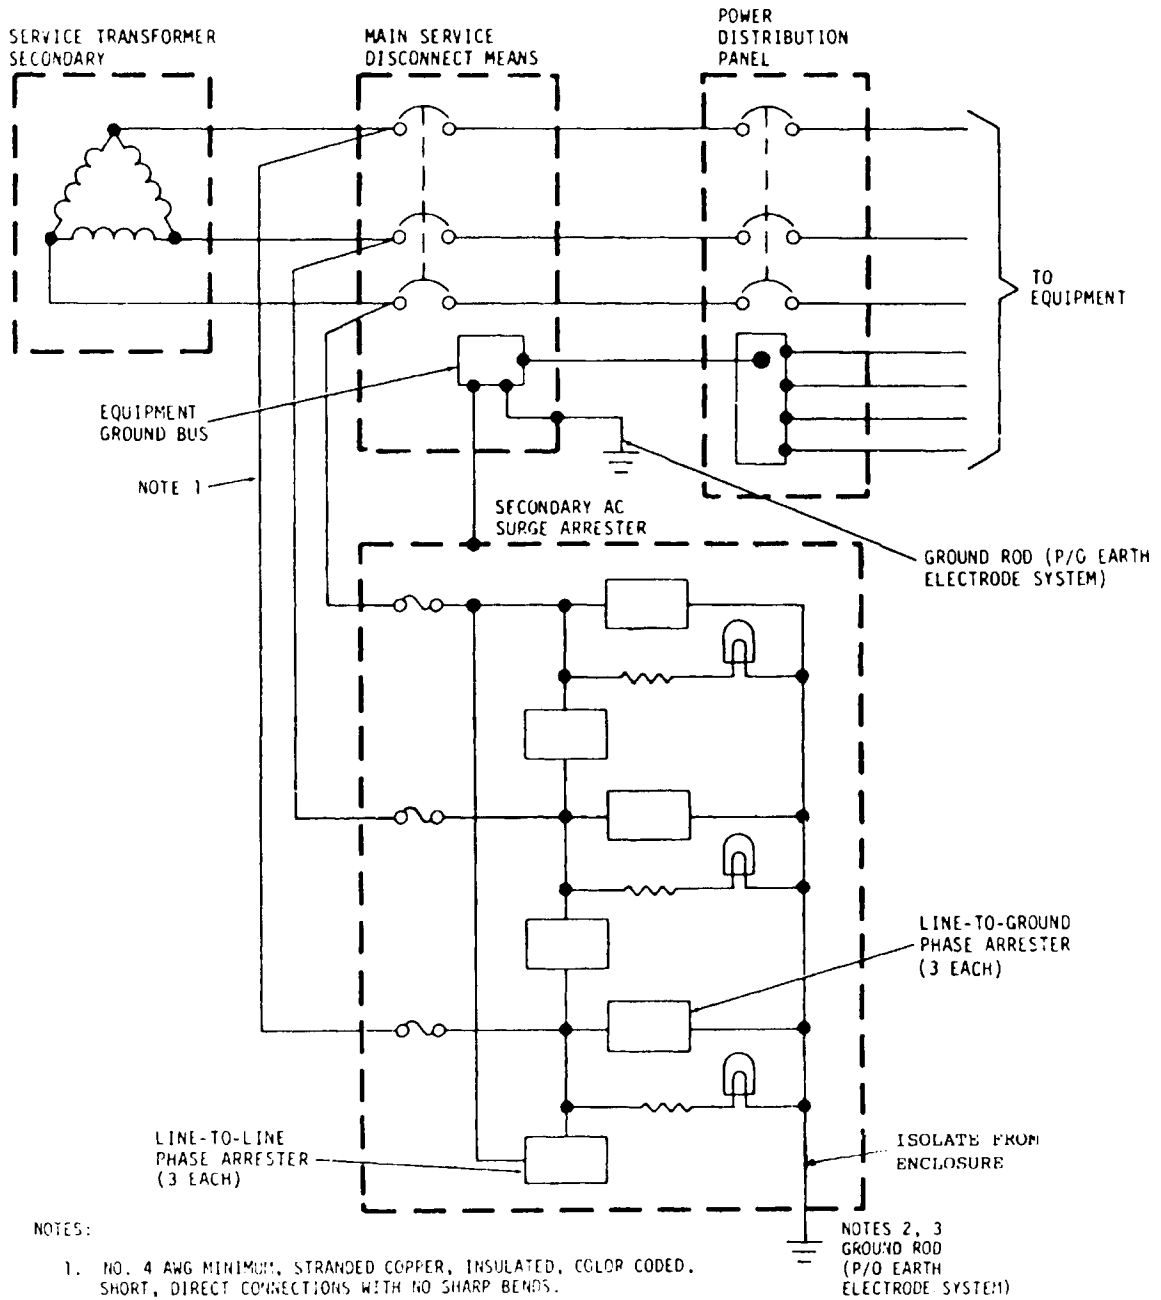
Secondary AC Surge Arrester Installation, Ungrounded Service
